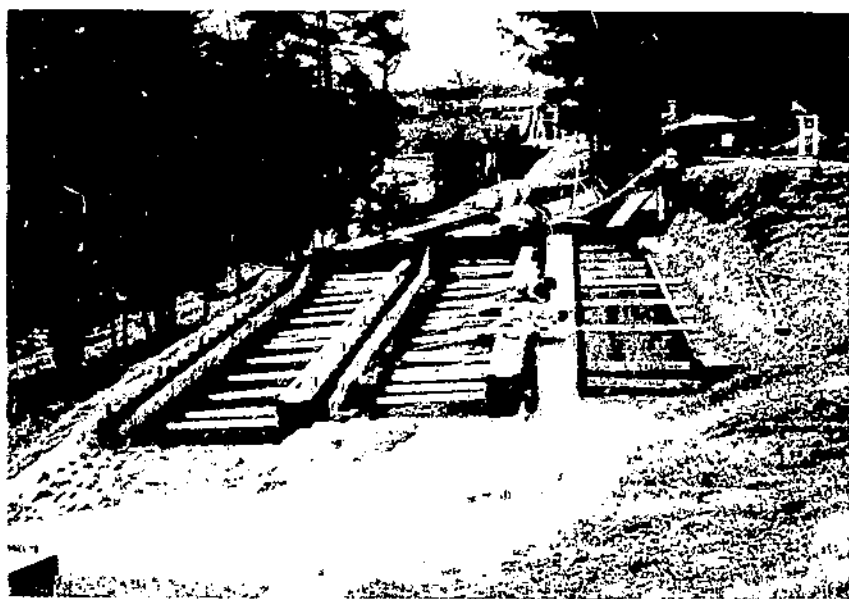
Typical arrangement of experimental channels having rectangular cross section and sheet-metal side walls.
